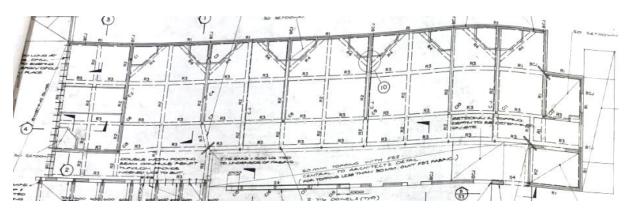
A Part Footing Plan of the Eastern End of Stage 3 showing the raft slab arrangement
